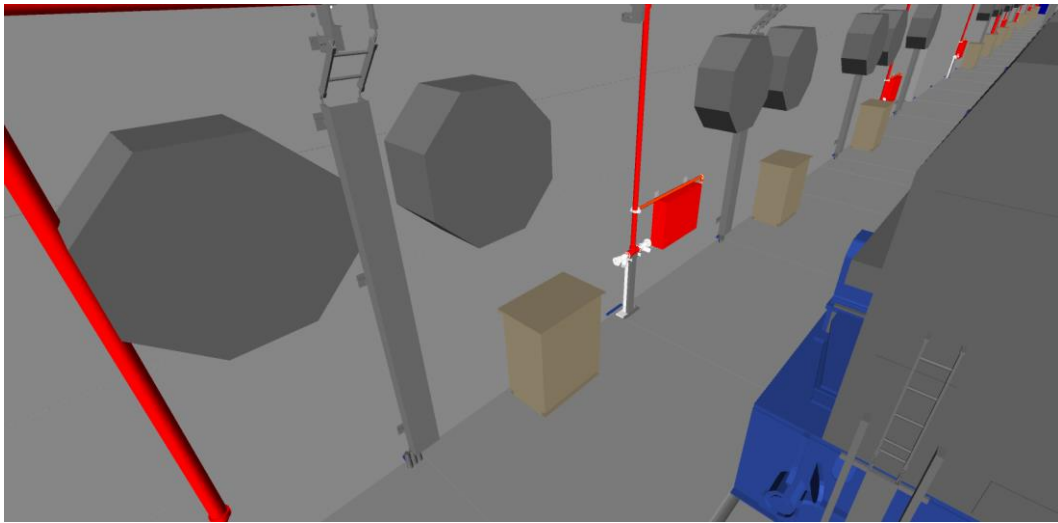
Case 2: neutral point cubicle installed next to the back wall in a project with W50 engines.
